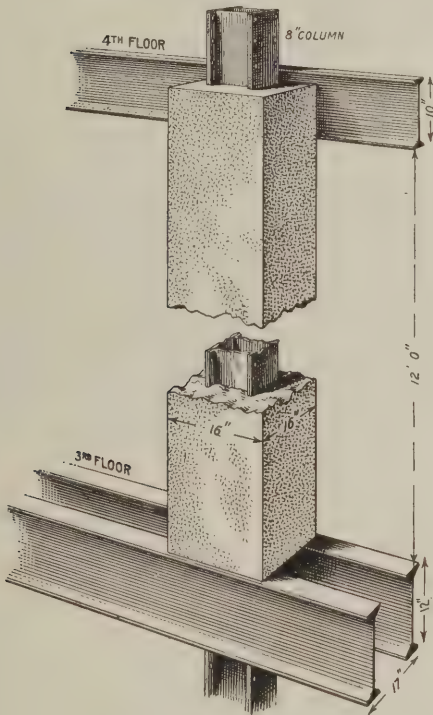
A Steel Column Protected by a 4-In. Coating of Concrete.
